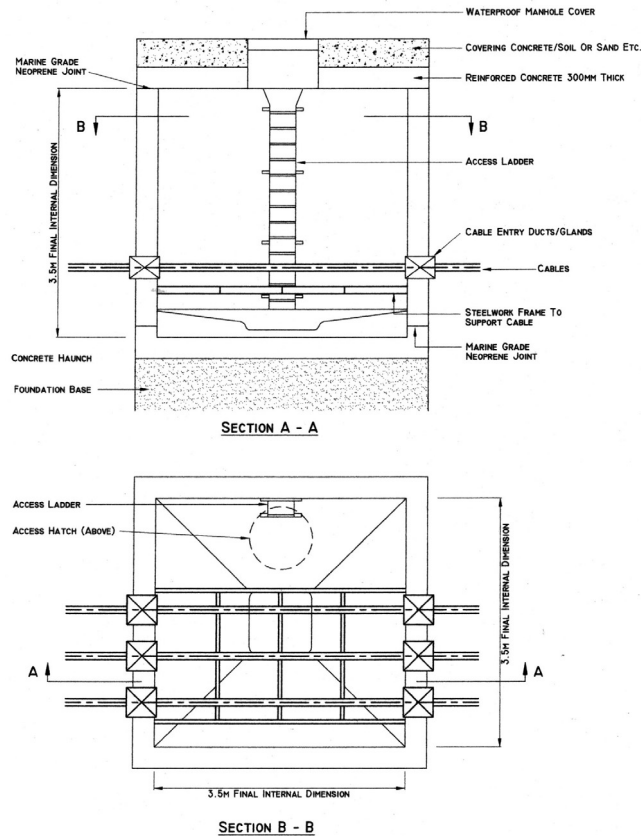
A typical interconnection facility schematic (Courtesy of Econnect Ltd)
